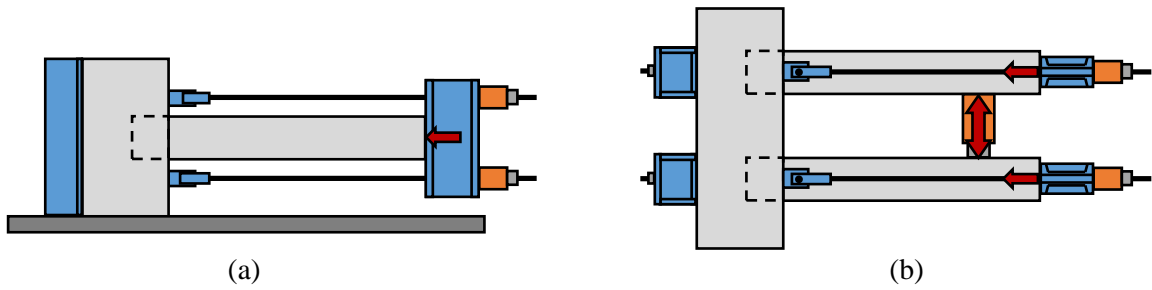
Schematic of proposed test setup (a) elevation and (b) plan view
